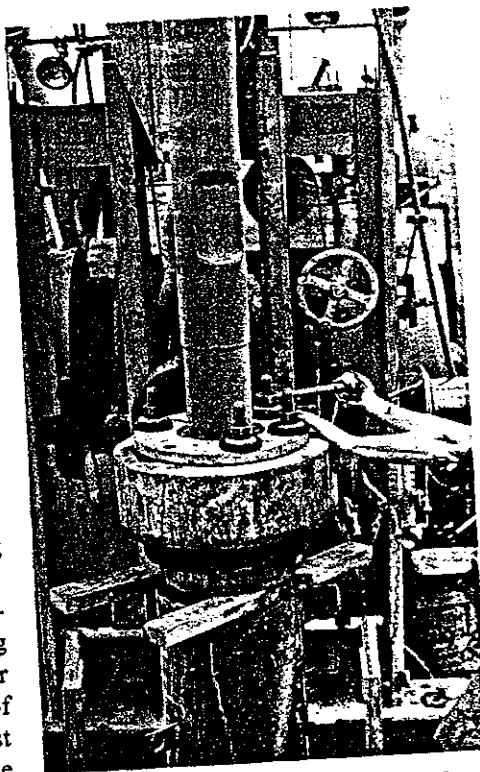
An alternative type of drive clamp (sometimes called a drive block) is shown being attached to the drill string.
